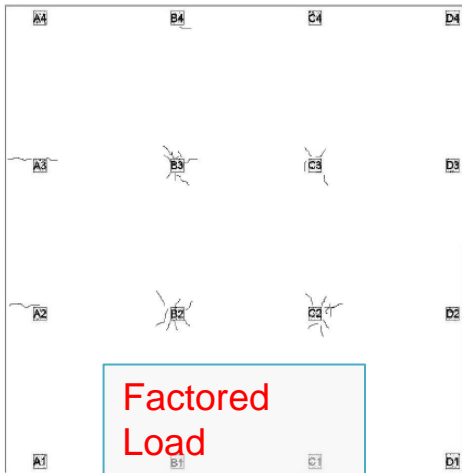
Top of Slab Crack Pattern at Factored Load
